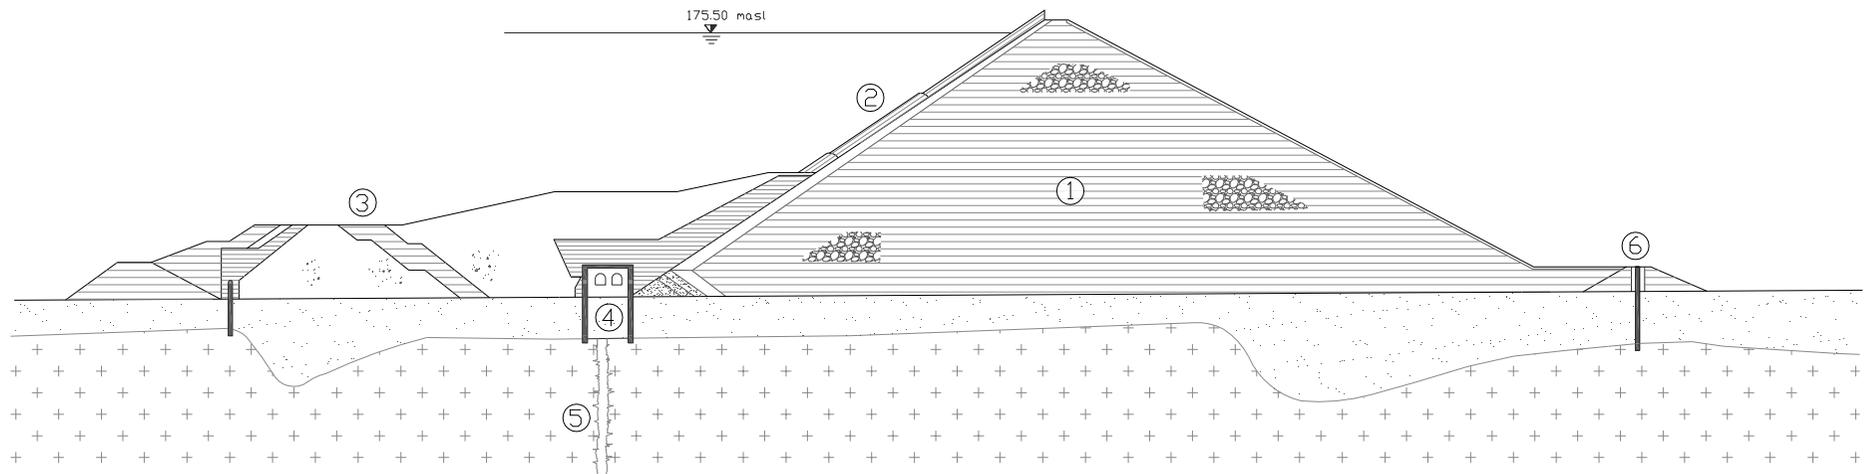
Cross section of Koman Dam. ①: rockfill dam, ②: concrete slabs, ③: previous upstream coffer dam, ④: control galleries, ⑤: grout curtain, ⑥: previous downstream coffer dam.
